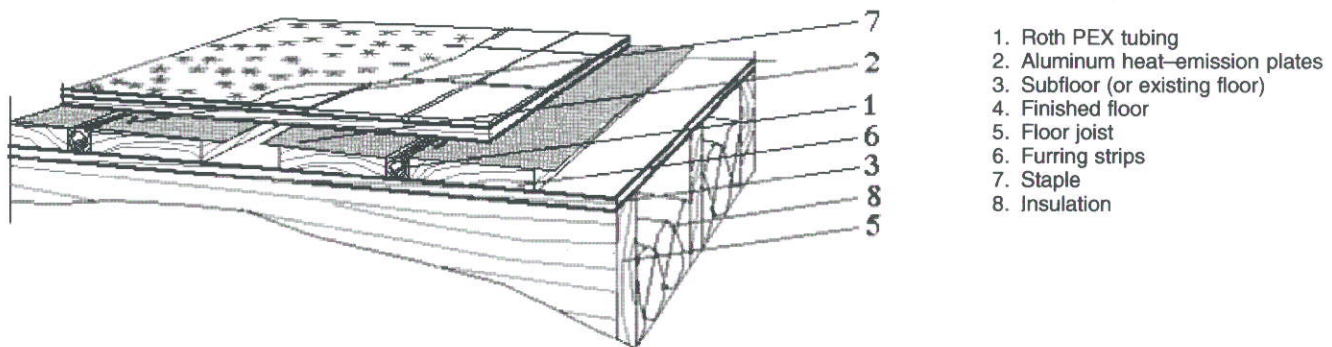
SUSPENDED FLOOR, INSTALLATION FROM ABOVE
